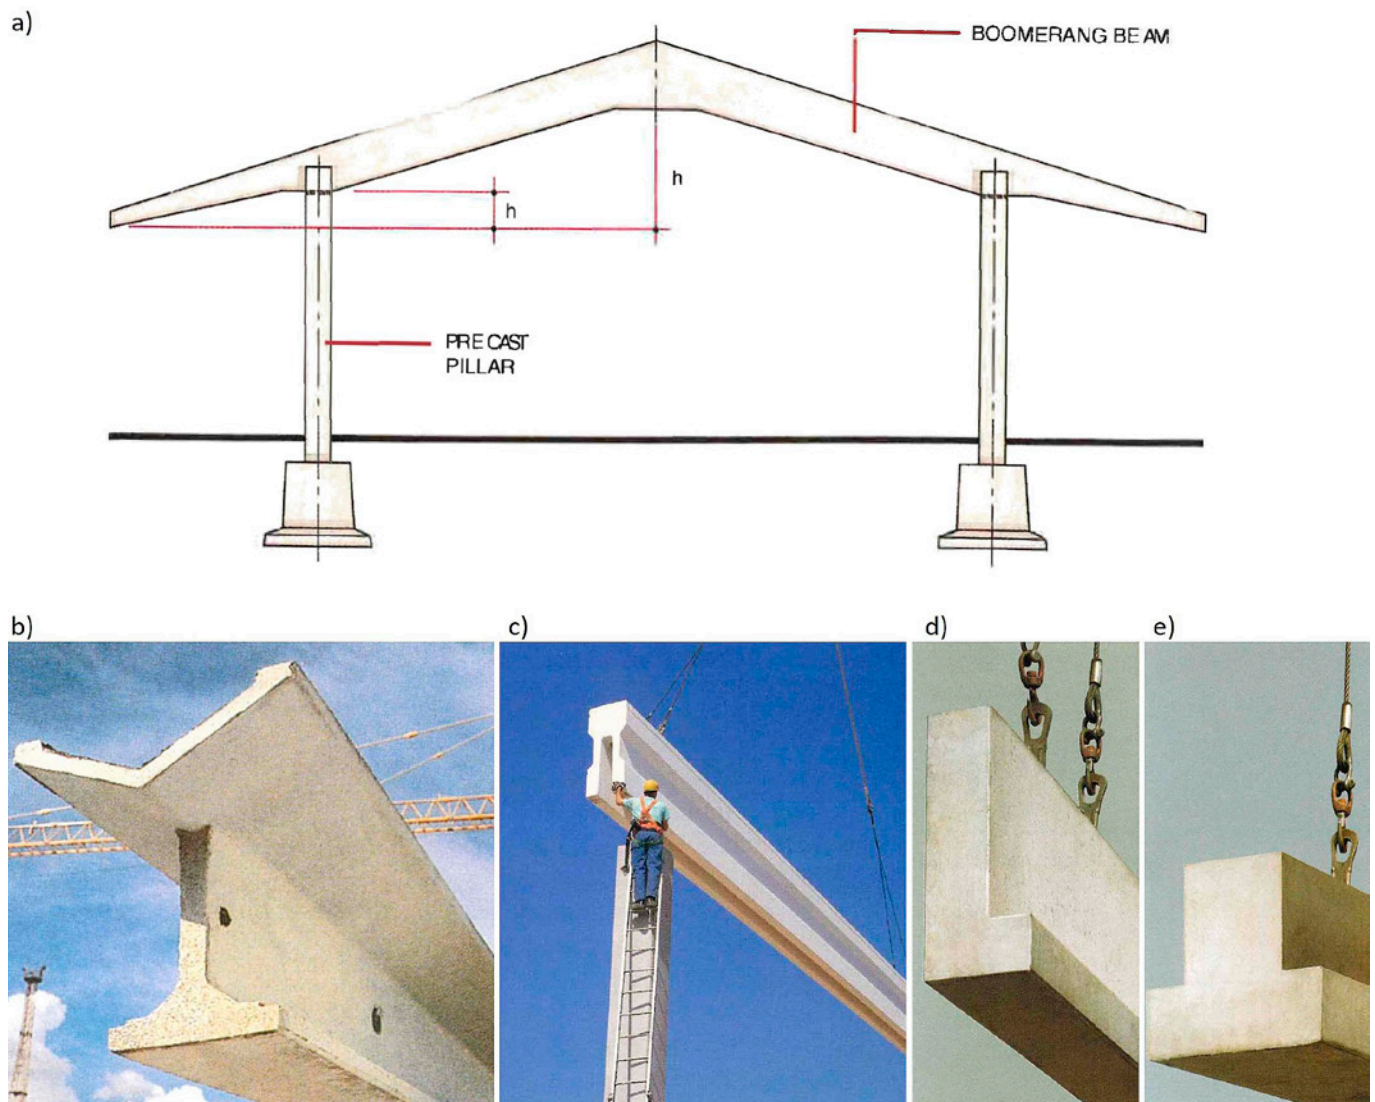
Types of beams: (a) boomerang beam; (b) Y beam; (c) H beam; (d) L beam, and (e) inverted T beam. Source: [23].
